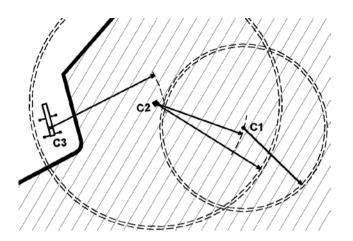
Crane Located within Structure Floor Plan – Business Centre Bratislava Lamač
